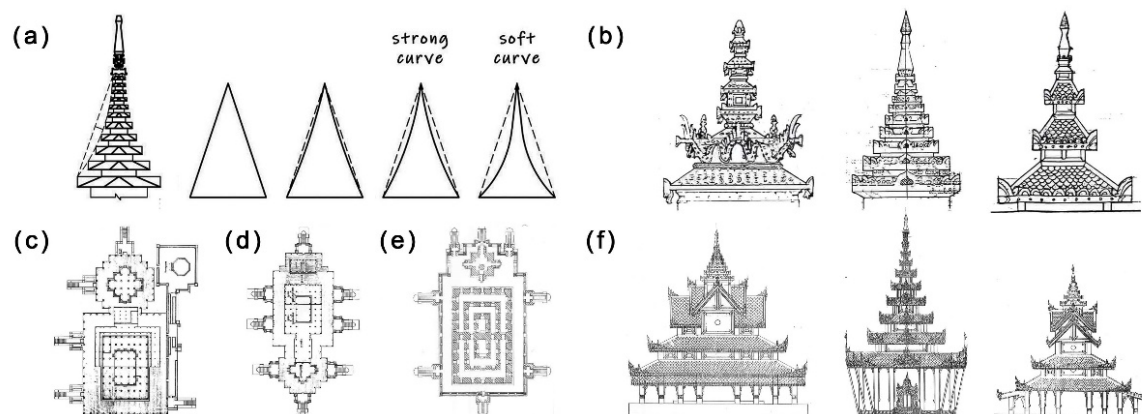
(a) Proportion of Pyatthat [5]; (b) Evolution of Pyatthat [5]; (c) Plan of Bargayar Monastery [4]; (d) Plan of Shwe-In-Pin Monastery [4]; (e) Plan of Mal-Nu Monastery [4]; Elevations of the Kanbawzathadi Palace's buildings [7].
